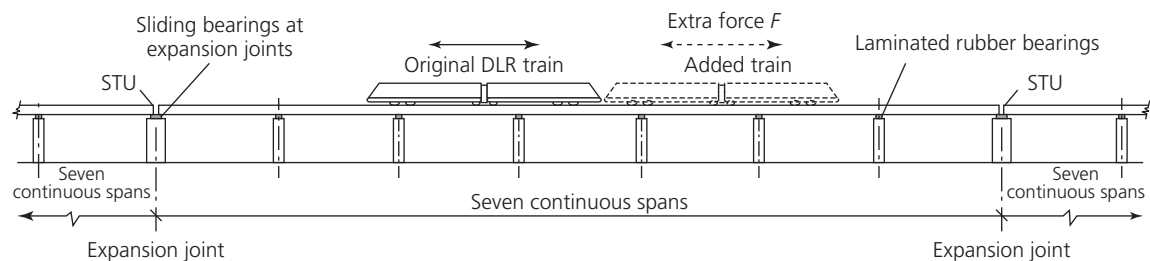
Sketch showing a typical seven-span continuous viaduct on the DLR (Pilgrim and Pritchard, 1990). © Institution of Civil Engineers
